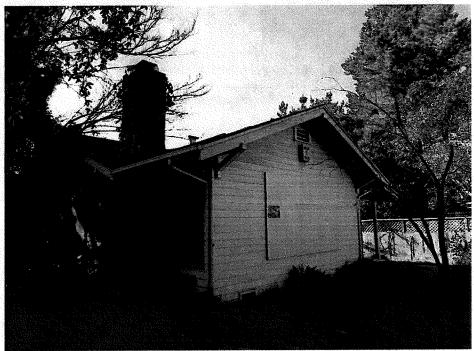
Exterior brick chimney on the east façade, view southwest (ARG, January 2019)
